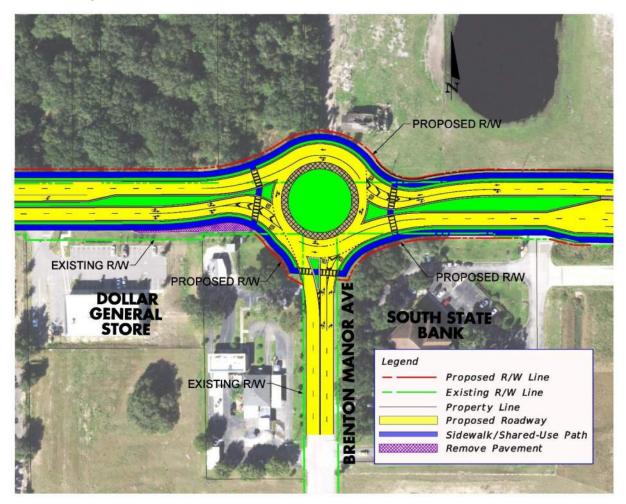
Brenton Manor Avenue Intersection Preferred Alternative
